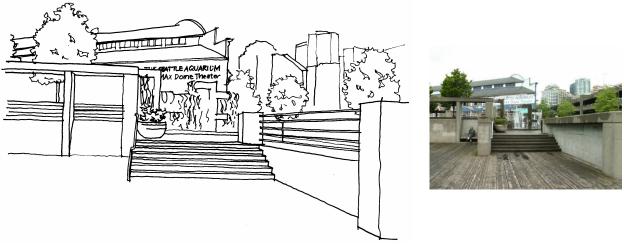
Existing condition (right) and sketch (left) of proposed modifications to the wall along the promenade.
